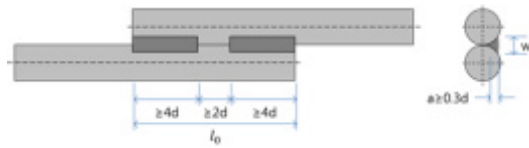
Detail of Lap Welded Joint [4]
